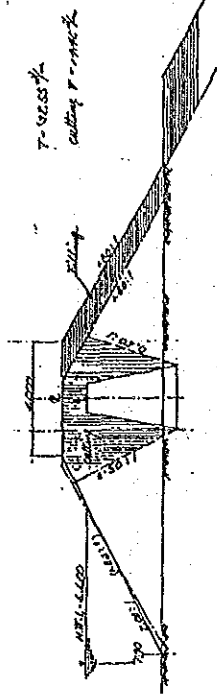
EARTH WORK FOR PROPOSED CORE WALL
